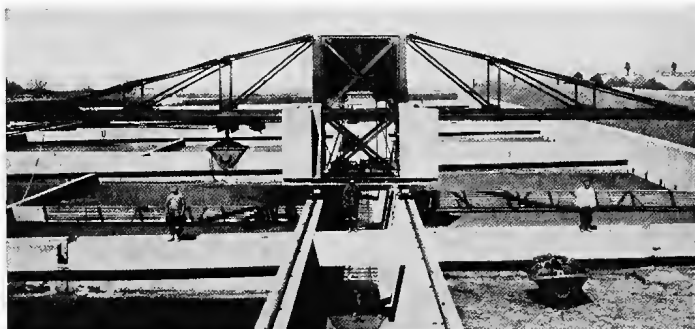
Equipment for cleaning sludge beds at Irondequoit plant, Rochester, N. Y.
